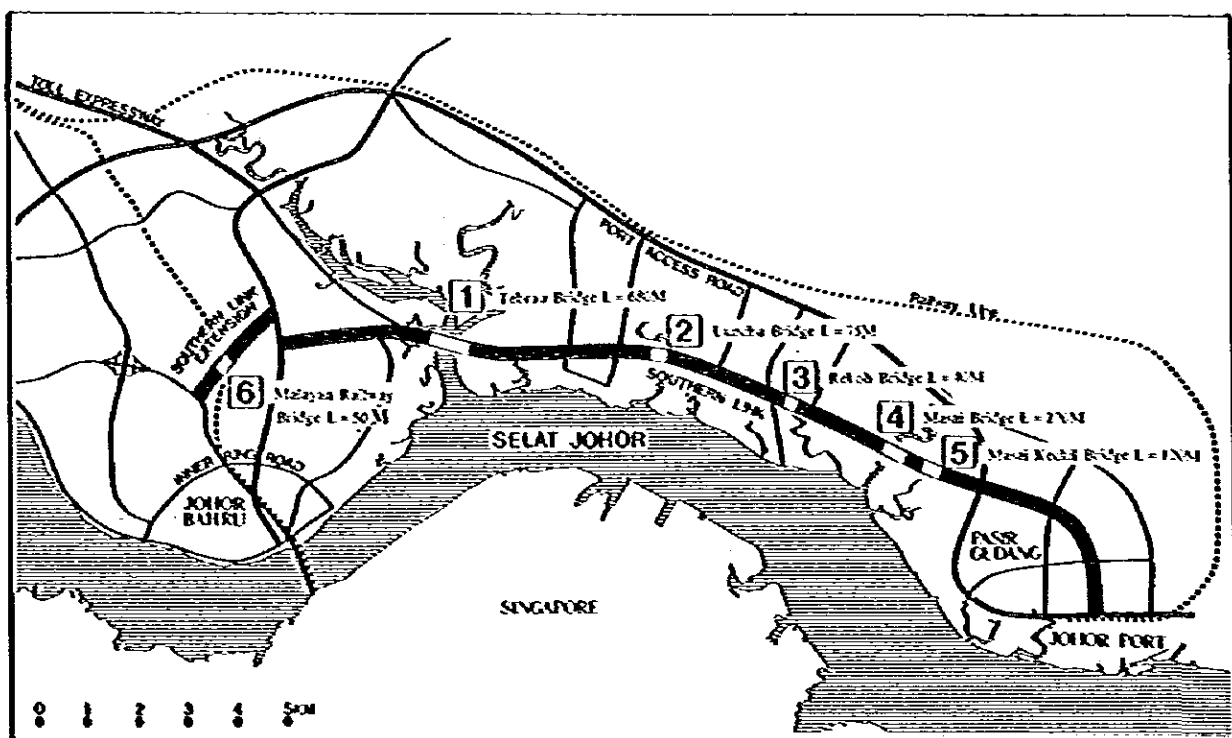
BRIDGE PLAN ON SOUTHERN LINK AND ITS EXTENSION
